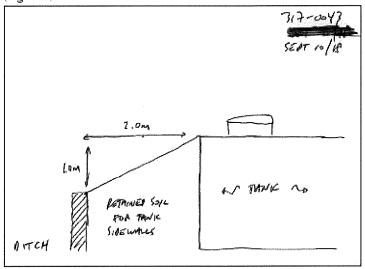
RETAINING WALL RELOCATION DESIGN DRAWING PROVIDED BY CLEARTECH.
